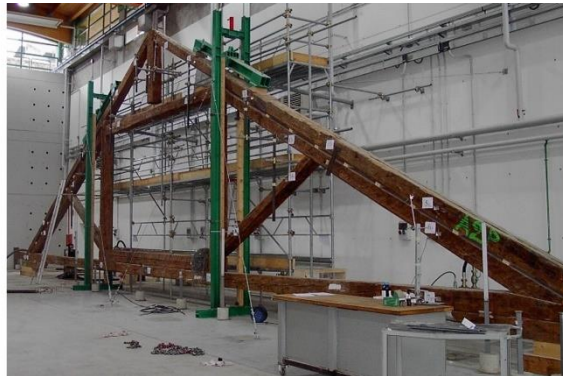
Full-scale laboratory test setup - University of Trento [130]
